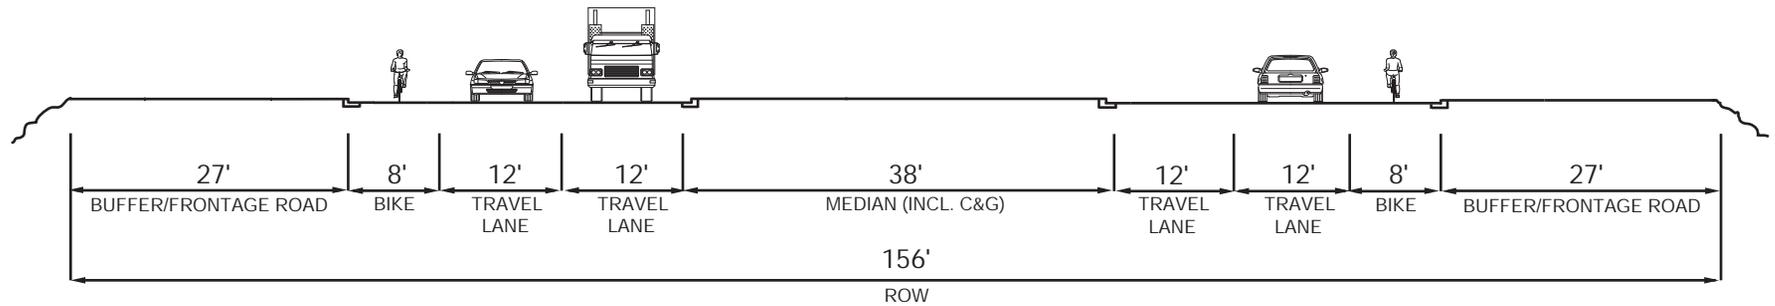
Street Type 7.1: Urban Boulevard A
